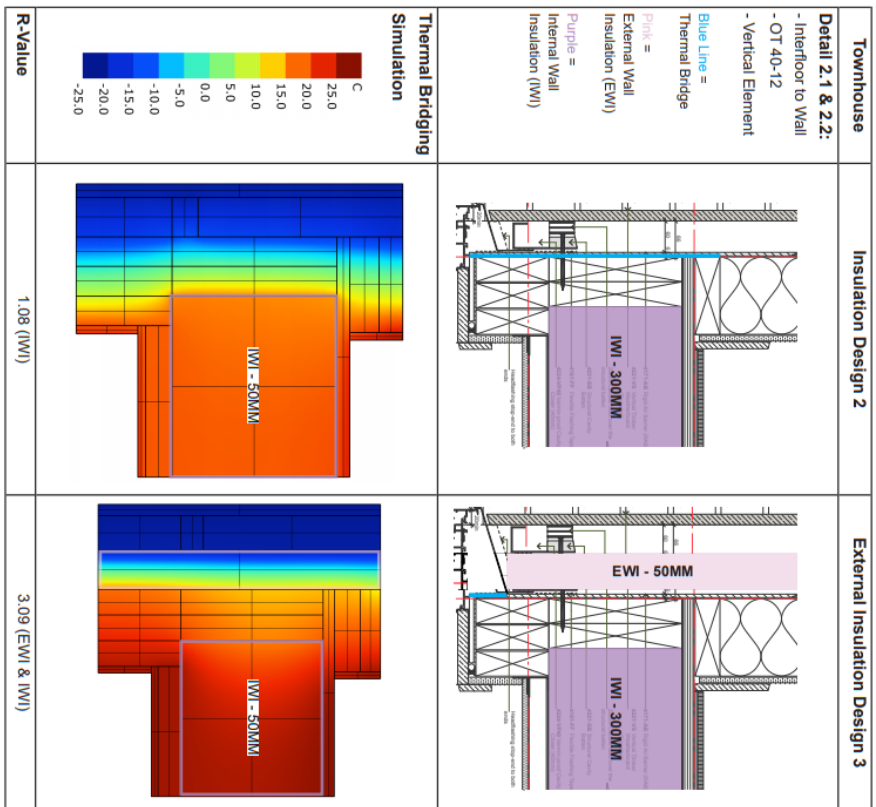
Detail 2.1 & 2.2 simulation, townhouse
